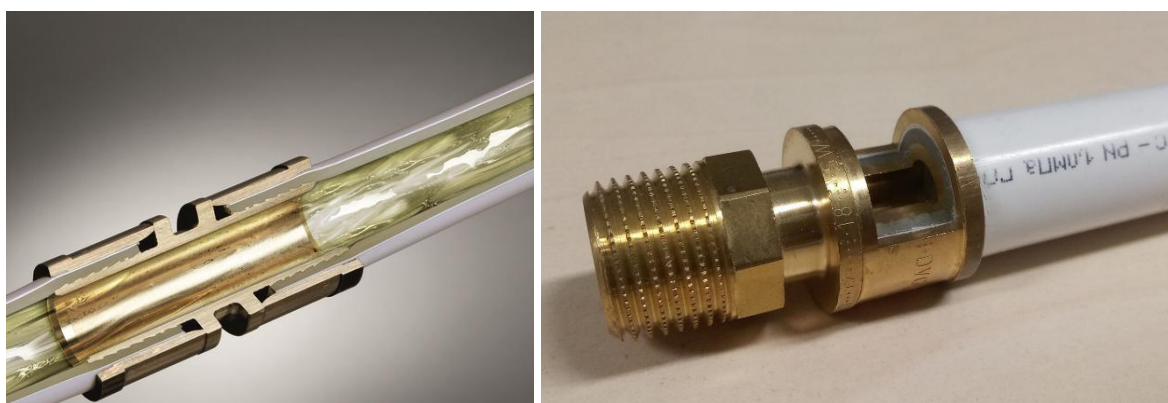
Axial joint – cross-section of a finished joint (Promotional materials of KAN-therm)
